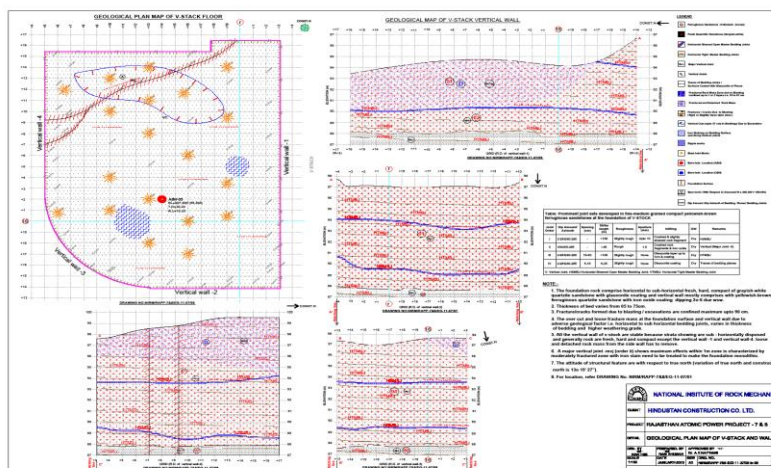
Geological Mapping of foundation floor and vertical of V. Stack building of RAPP 7&8
